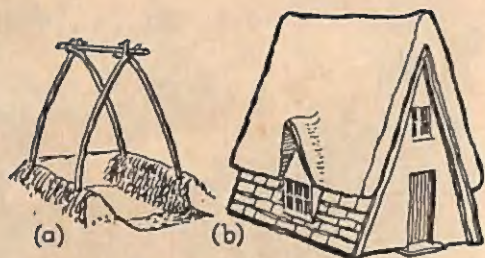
(a) The framework of an early British house with sunken floor; (b) A very old cottage in Lincolnshire, all roof and no wall.
